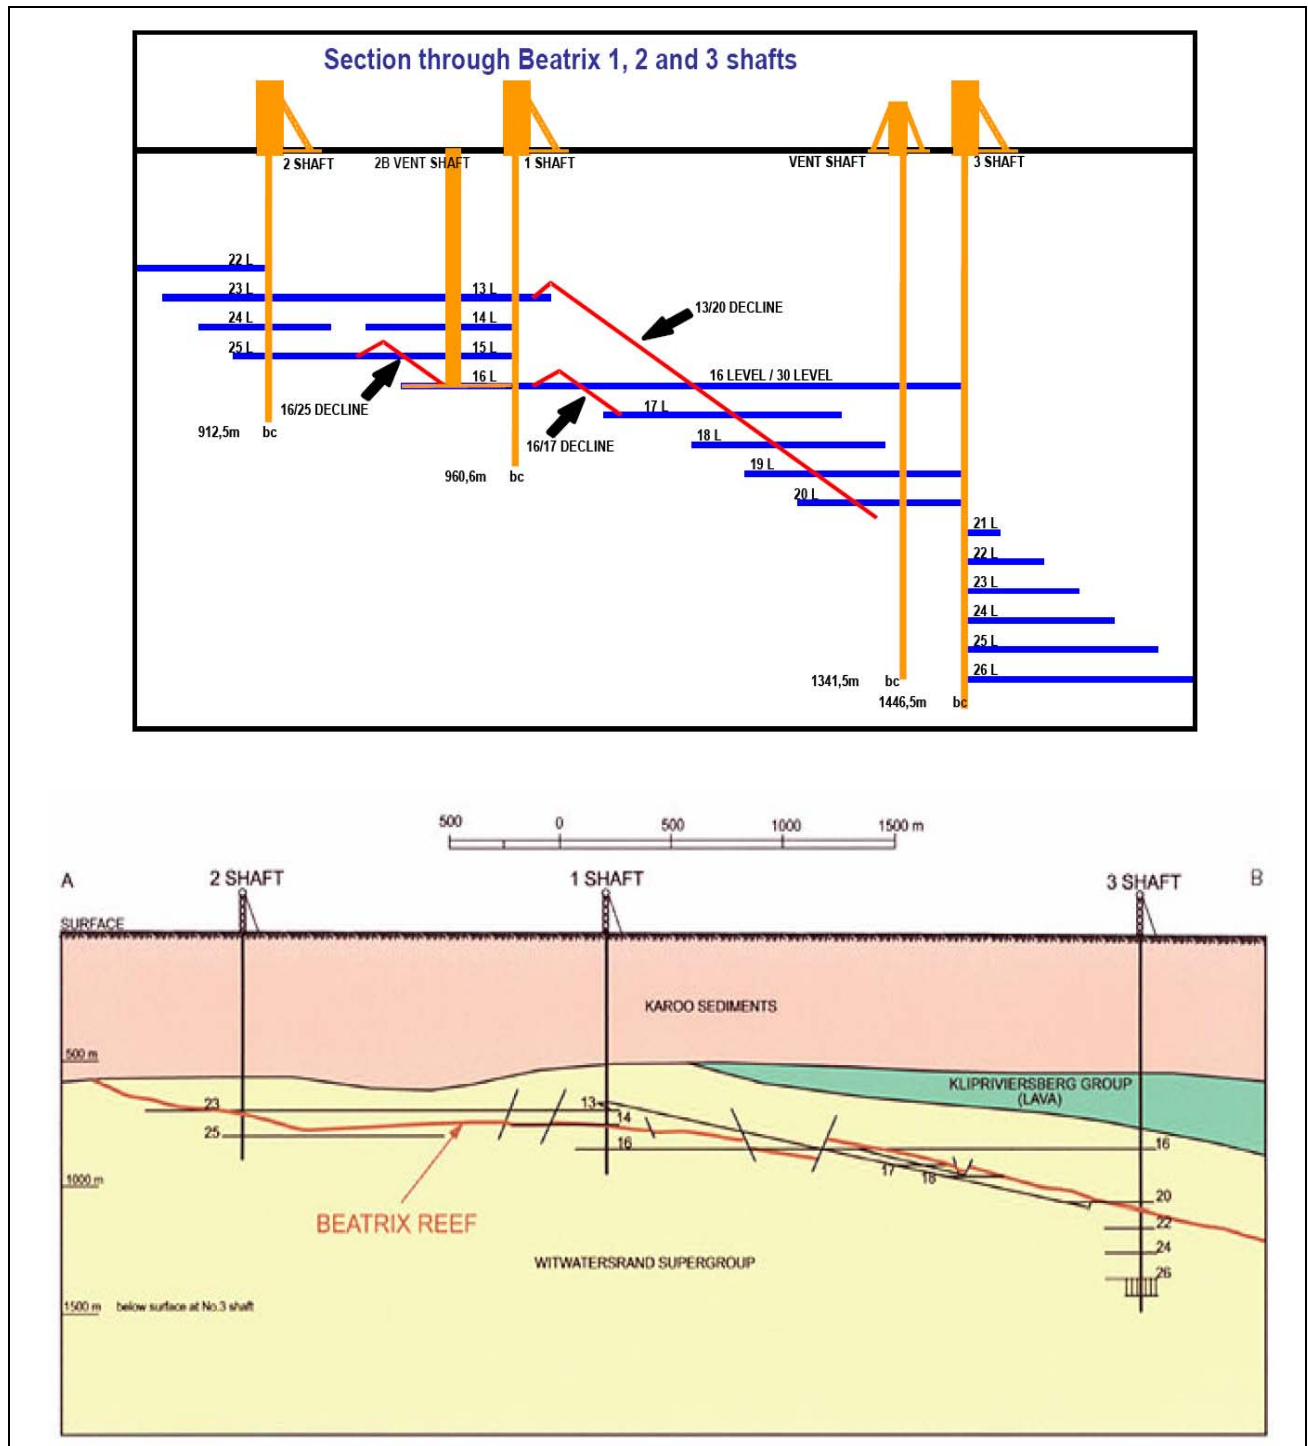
Schematic arrangements of the Beatrix 1, 2 & 3 Shafts ventilation arrangement
